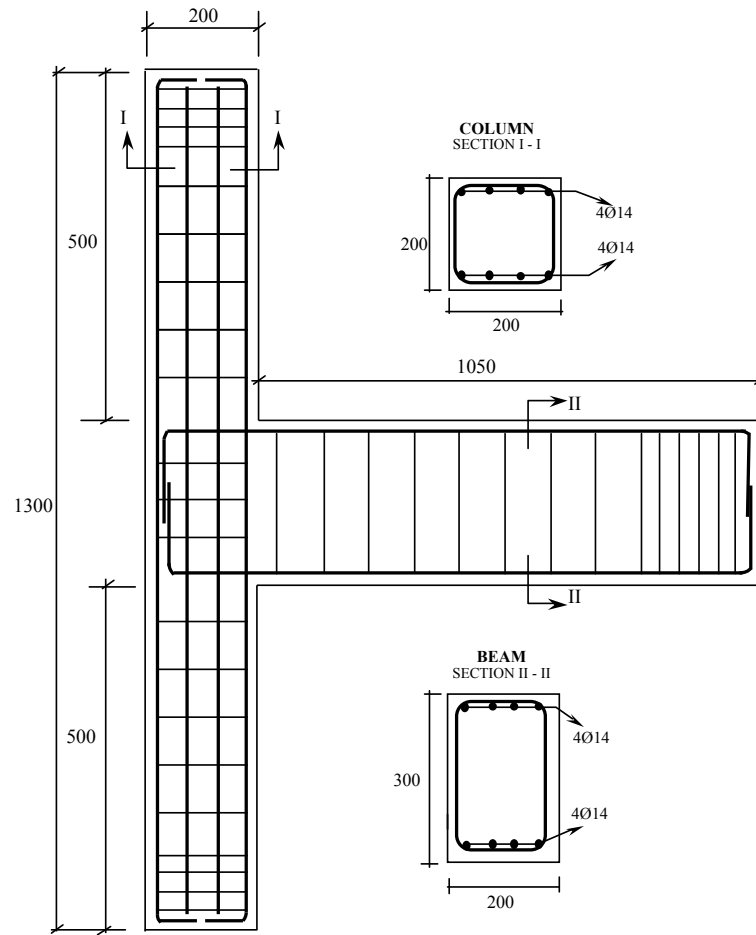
Reinforcement detail for beam-column joint specimen, Tsonos et al. (1992)
